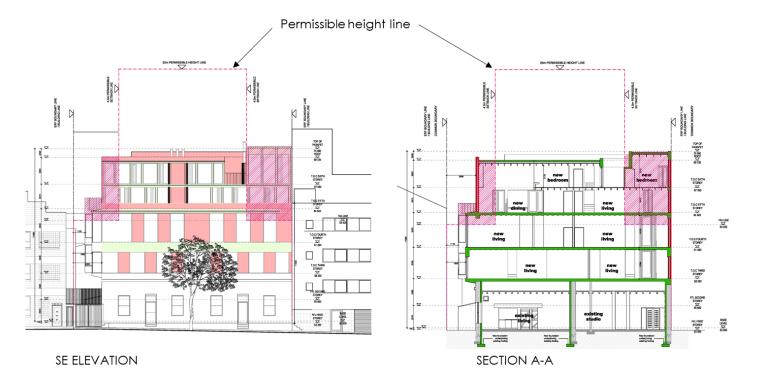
Buitengracht Elevation and Section MU2 zoning envelope shown in Magenta dotted line Source: KFA
